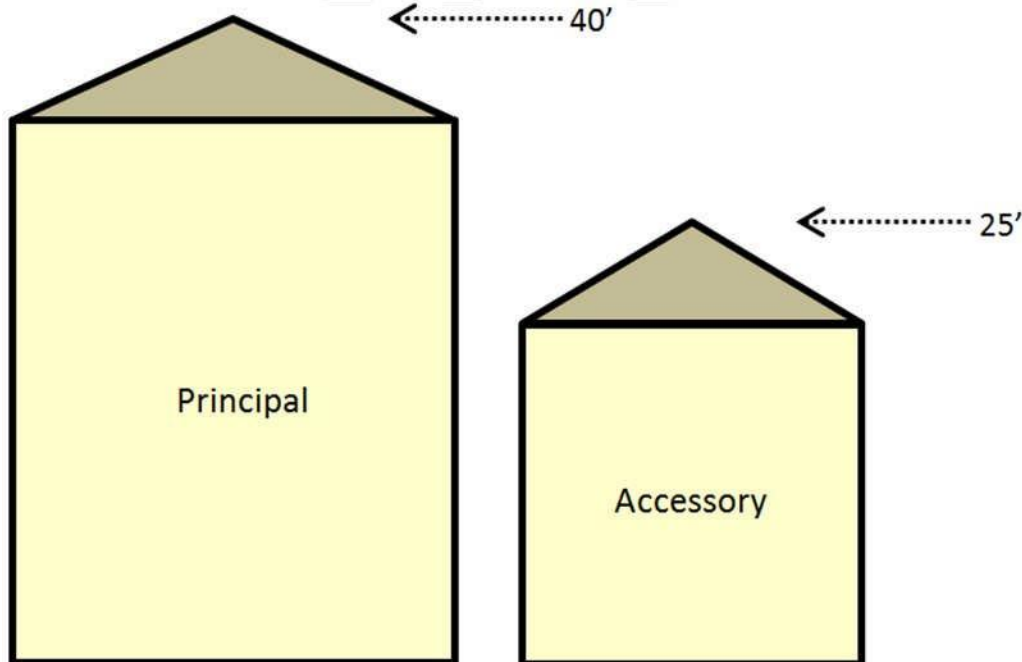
Typical VMU-2 Zoning District Building Height Example (Abutting Lots Not Developed) (Not Drawn to Scale)
